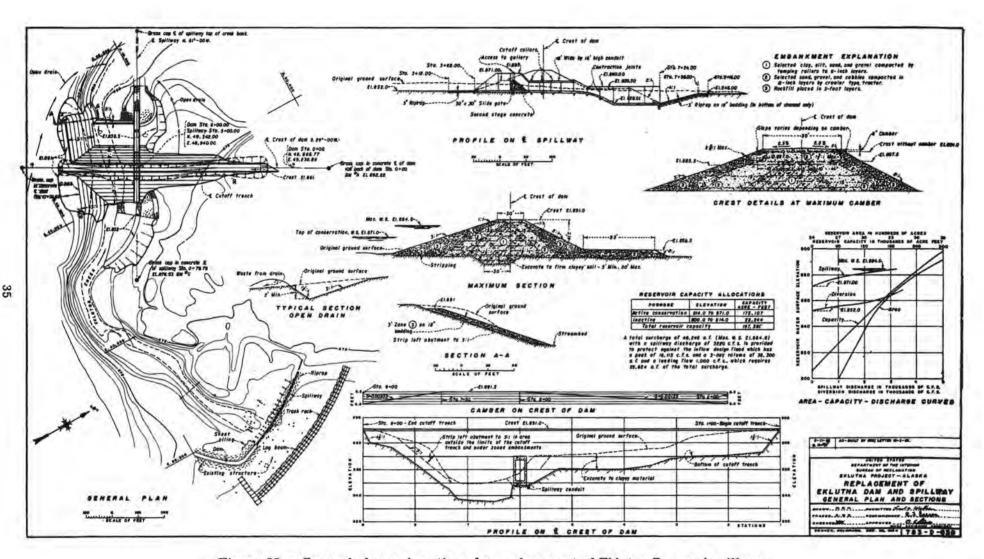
General plan and sections for replacement of Eklutna Dam and spillway.
